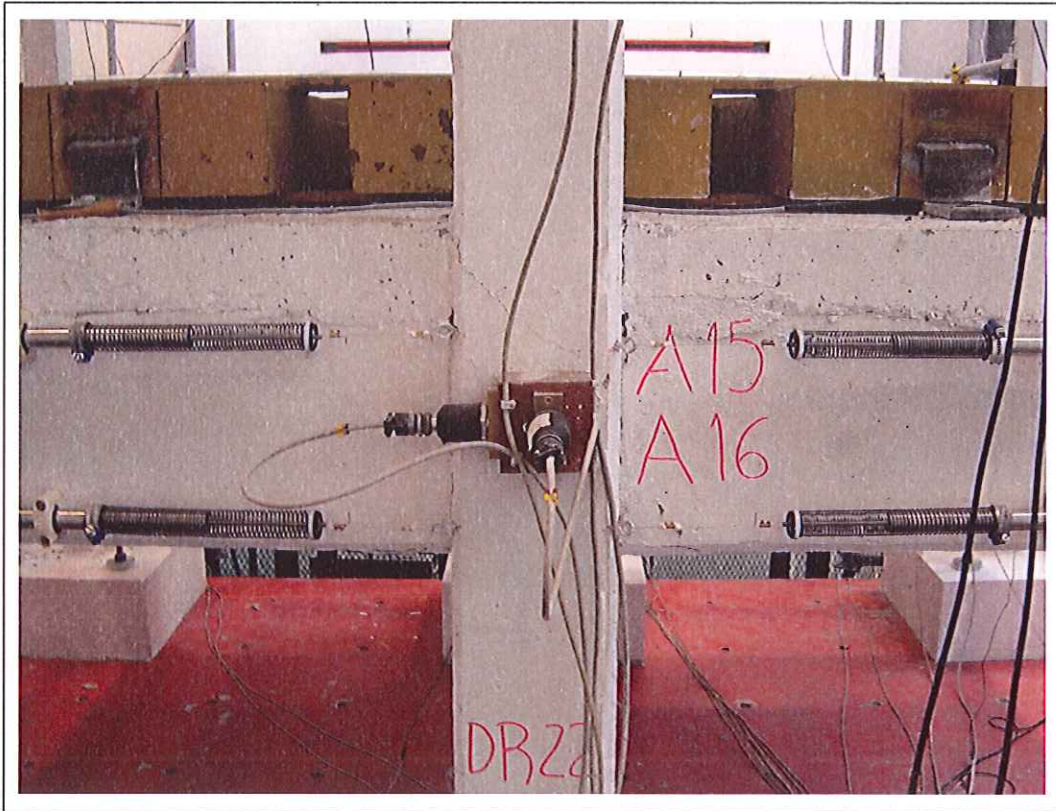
Detail of the beam-column connection after the test (J2-Long.)
